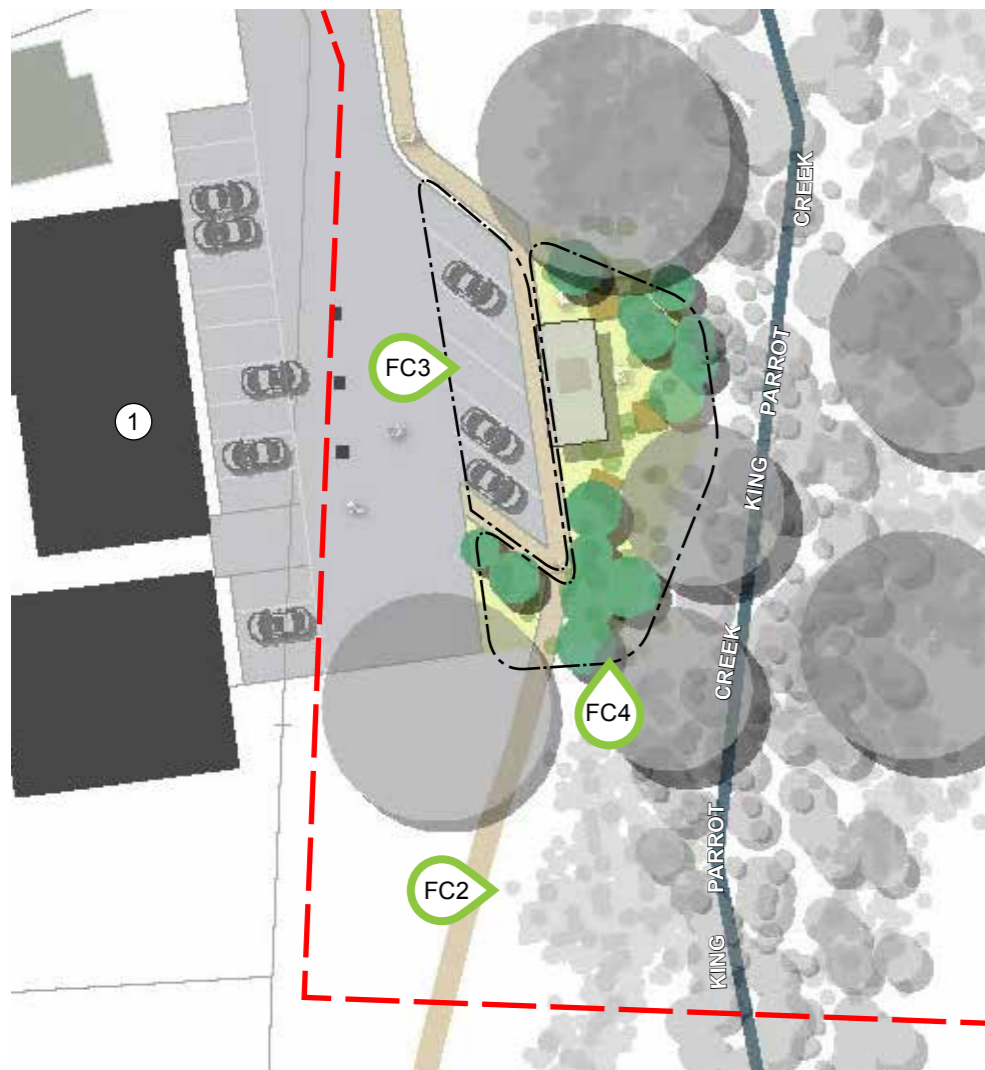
Flowerdale Central proposed streetscape master plan (south)
